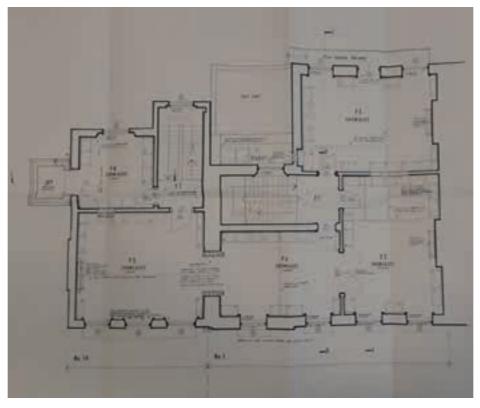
First floor plan of the properties in 1984, showing proposed internal alterations
